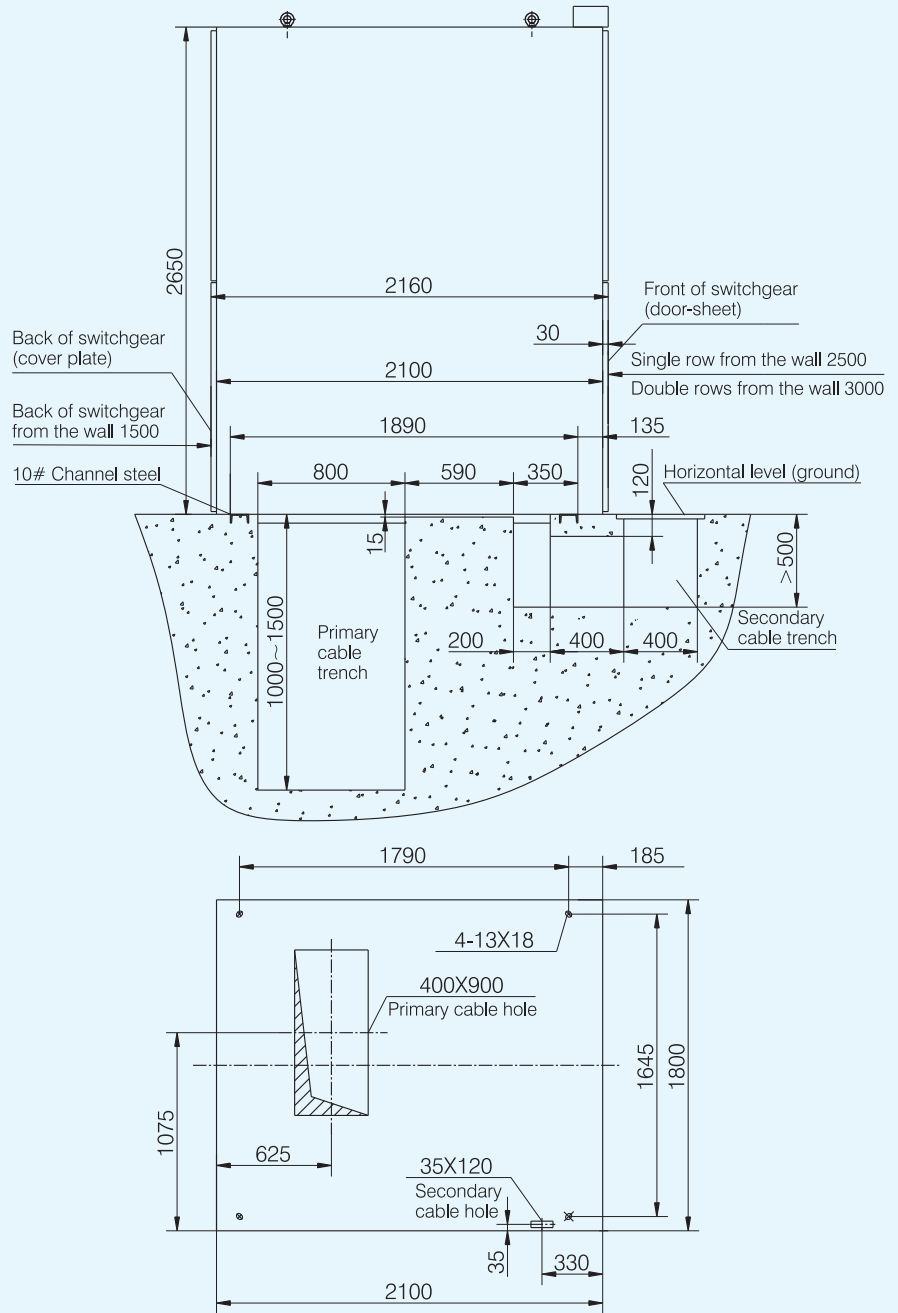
Construction diagram of the switchgear panel (Unit:mm)
